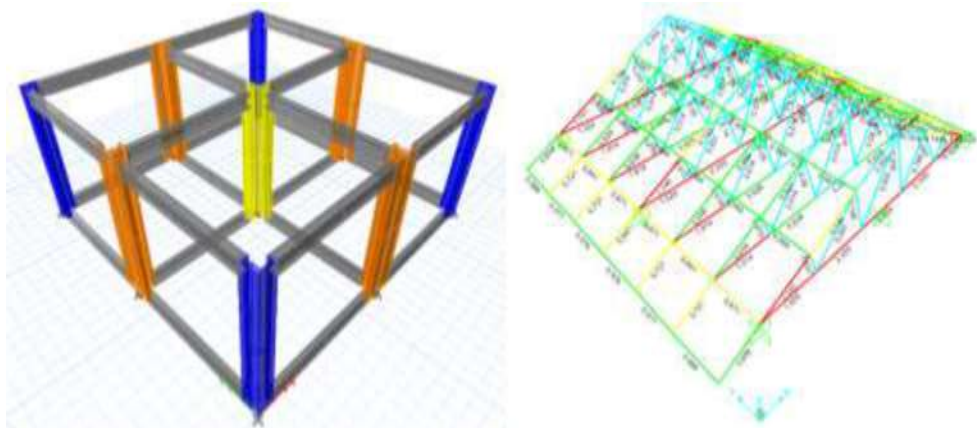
SAP2000 model of RISHA structure and Simulation result of the roof truss under wind load
